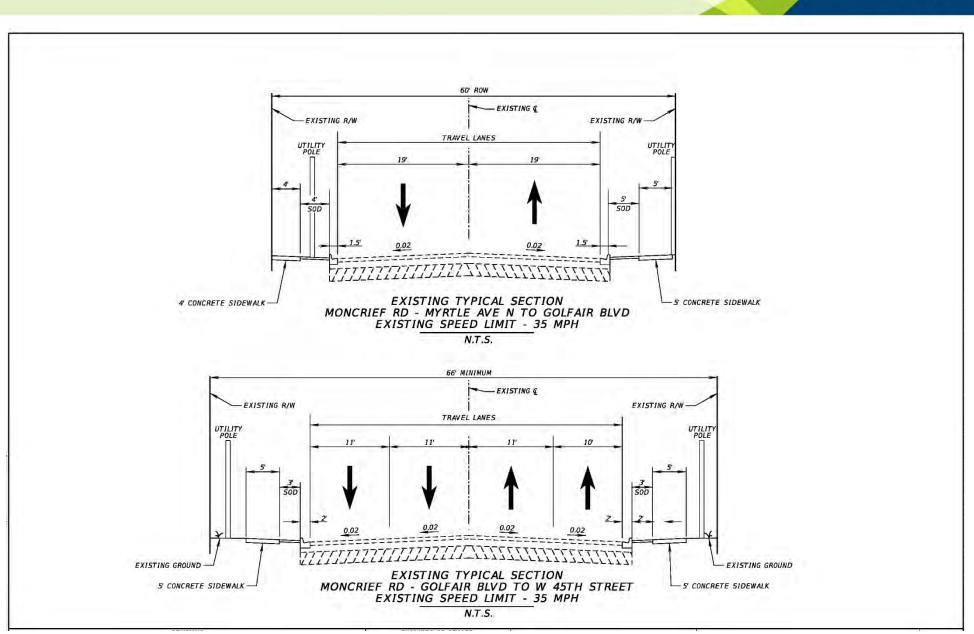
Moncrief Road Typical Sections (Myrtle Avenue to 45<sup>th</sup> Street)
